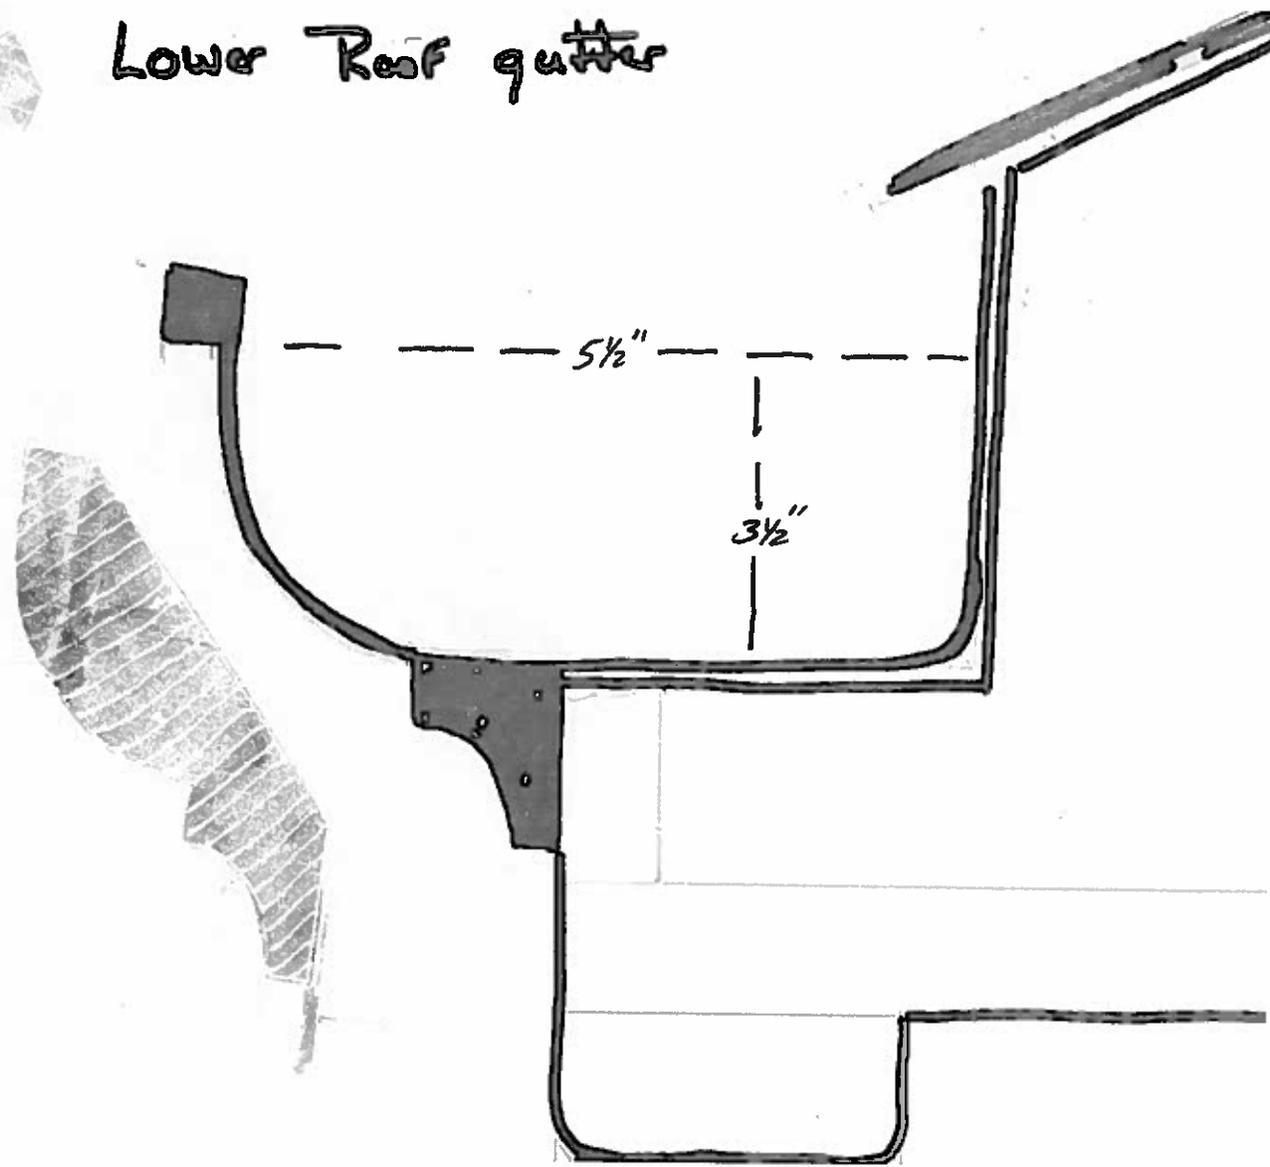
Proposed porch roof fiberglass gutter design with original profile alongside
